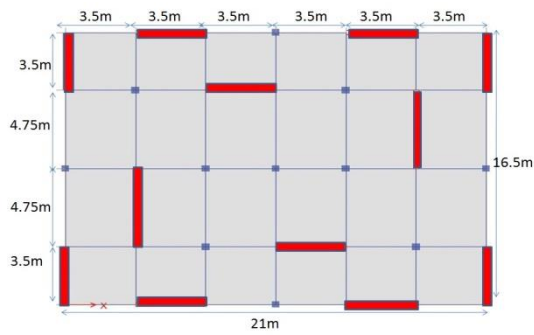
Plan of the building model with 2% shear wall ratio in each direction
